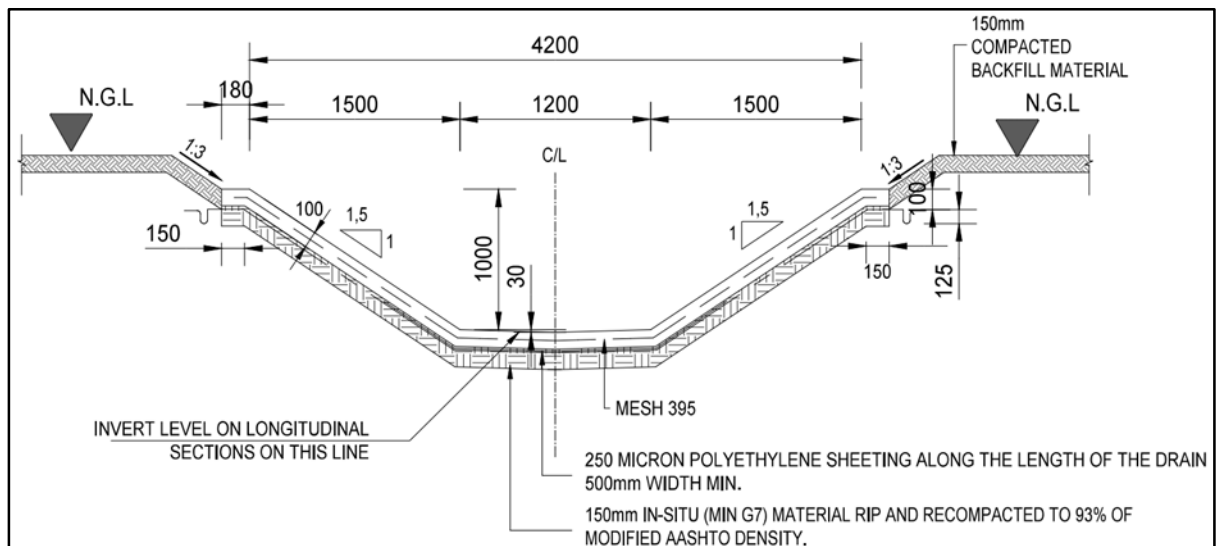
Typical cross-section of concrete lined trapezoidal channel.
